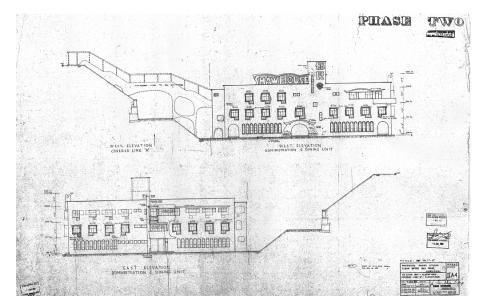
Architectural drawings of Shaw House, Clear Water Bay. (from Buildings Department, HK SAR Government, *Proposed Shaws Studio Clear Water Bay Road*, Hong Kong, Buildings Department, HK SAR Government, 1 Jun 1961)
